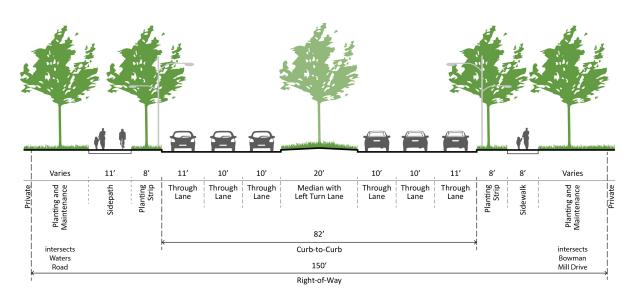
Proposed Typical Street Section for Germantown Road (North of the Railroad Tracks)
